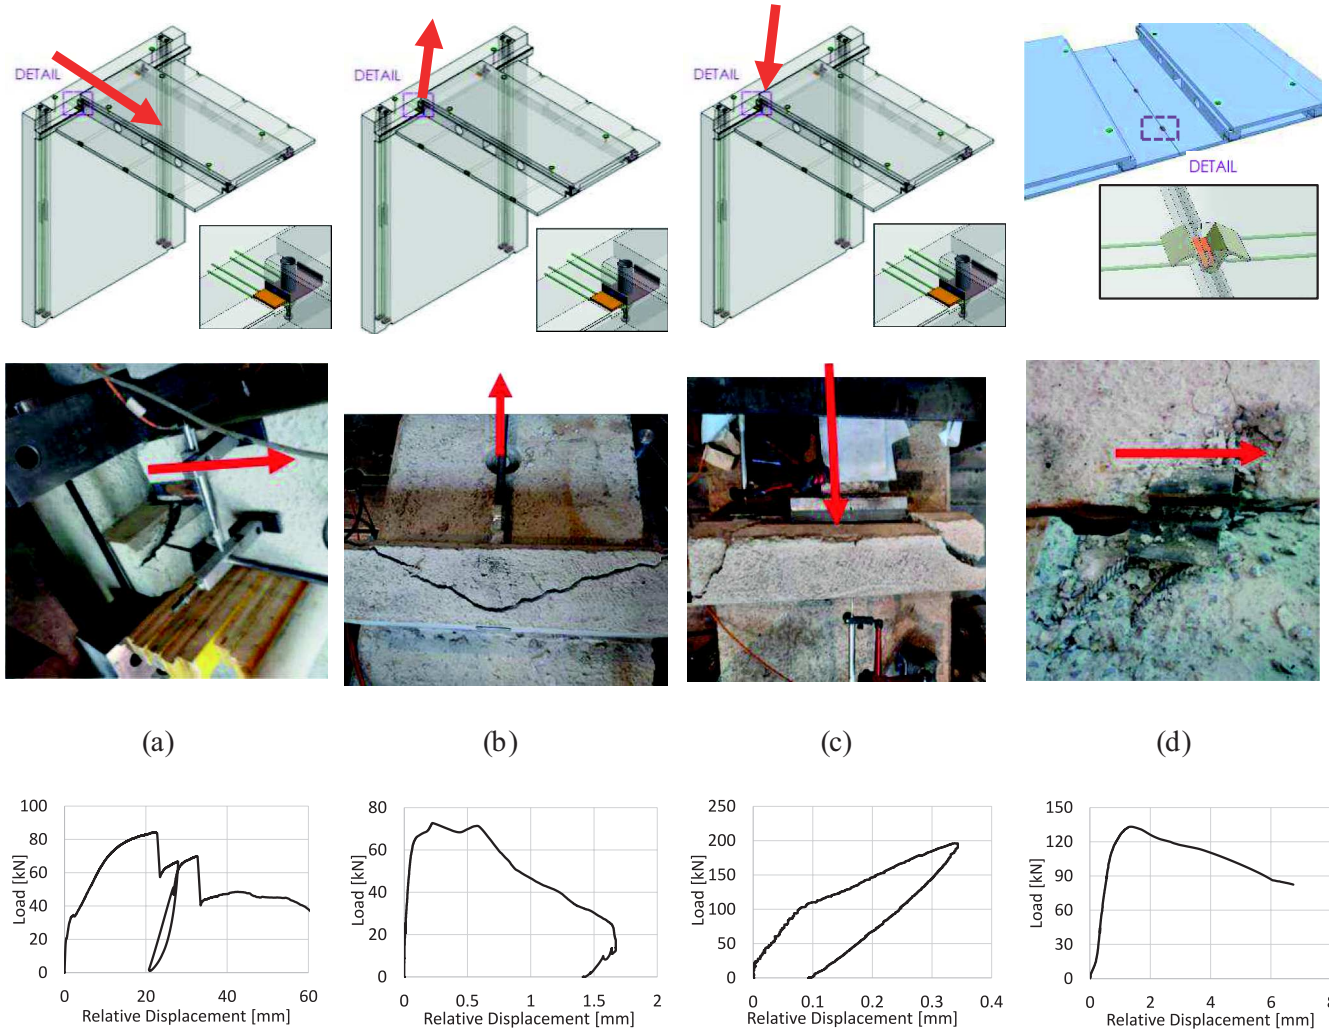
| Failure modes and results of laboratory testing of connections and joints: (a) slab dowel in shear, (b) slab dowel in tension, (c) wall/beam corbel in compression, and (d) slab-to-slab welded joint in shear.
